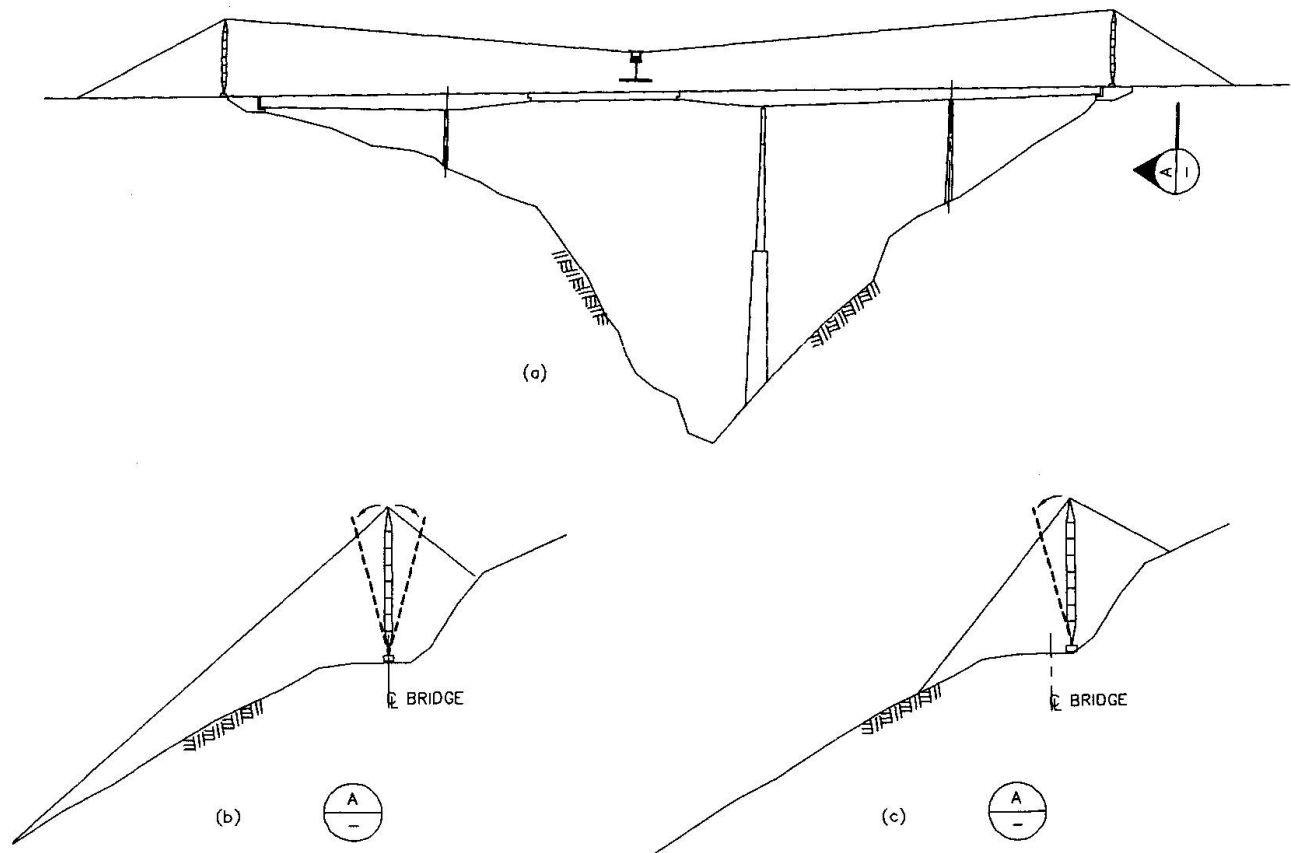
Carnes Creek Bridge (a) General Arrangement with highline, (b) Section A, highline centred, (c) Section A, highline offset.
